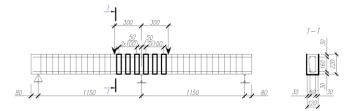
Scheme of the reinforced concrete beams strengthening.
